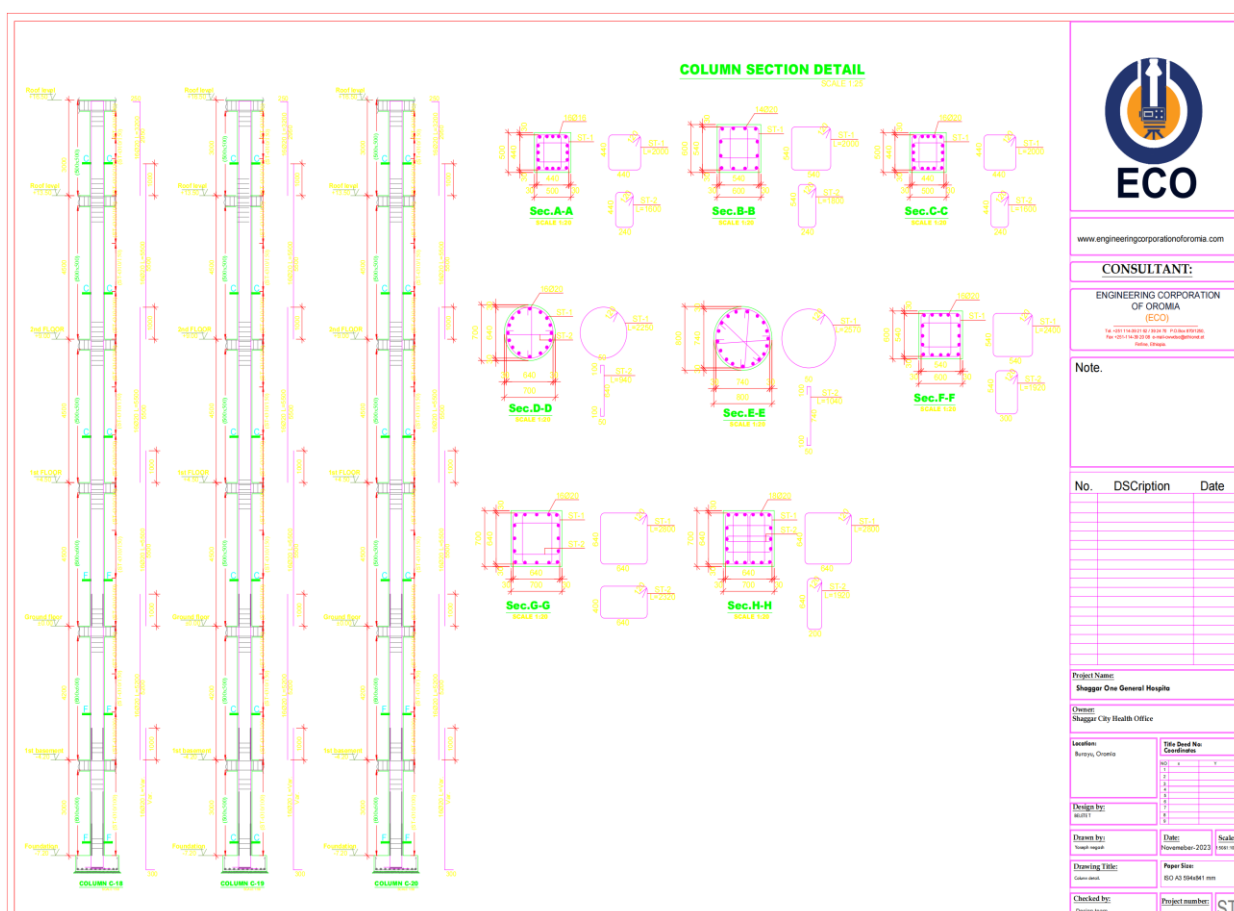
MHB Structural Design Column C-18, C-19, and C-20 and Section details of Column stirrups used in the MHB from Footing to Roof Level.
